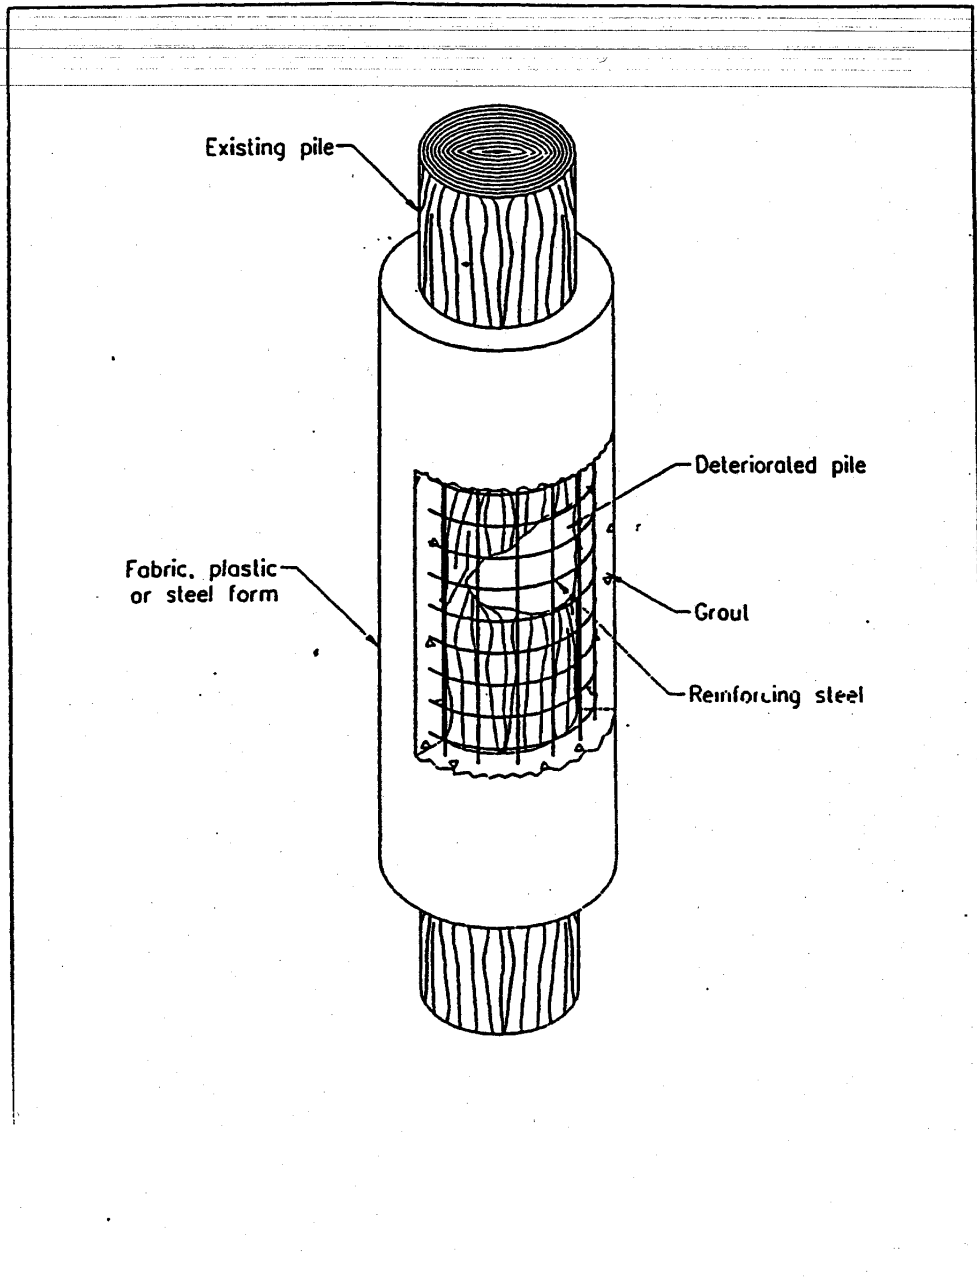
Pile restoration using cast in place reinforced concrete jacket.
